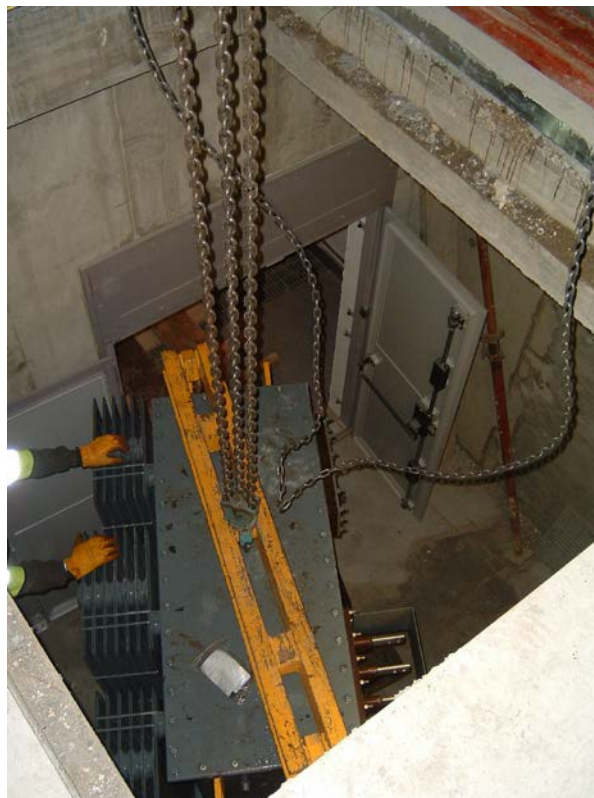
Plant 'drop-zone' should be as direct as possible, ideally adjacent substation doors – as above;
